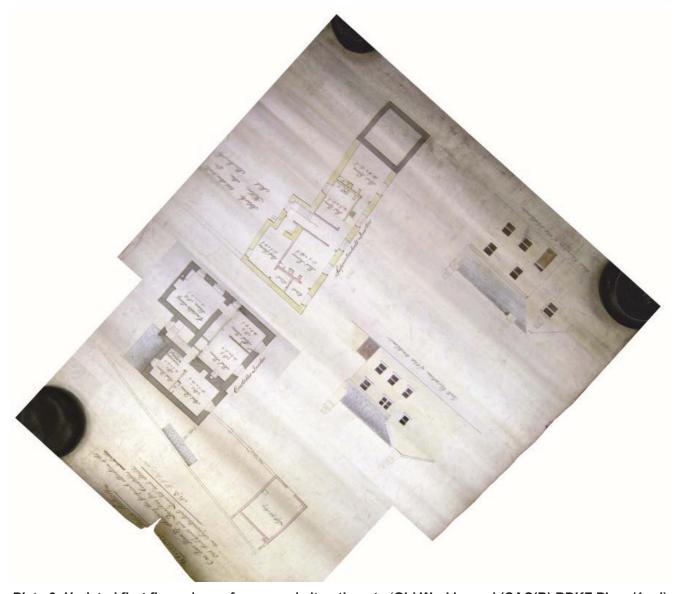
Undated first floor plans of proposed alterations to 'Old Workhouse' (CAC(B) BDKF Plans/4 nd)
